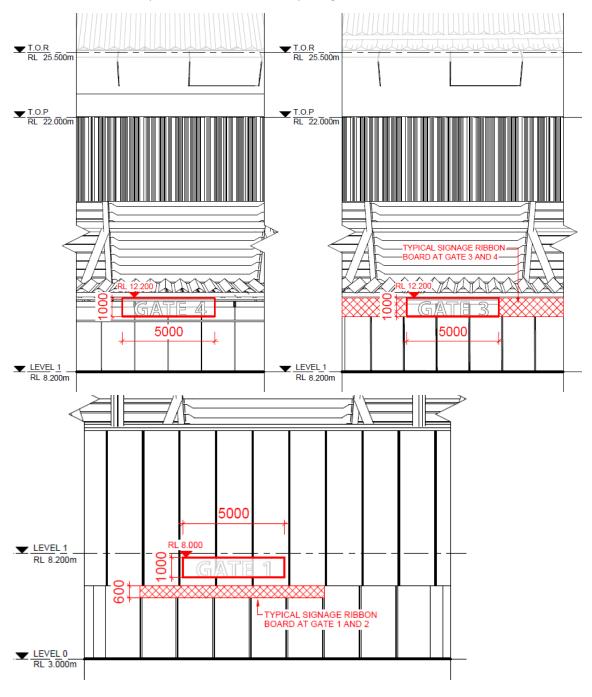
Extract from the Sign dimensions and elevation plan (source: Appendix A – Architectural Plans, Cox Architects)
